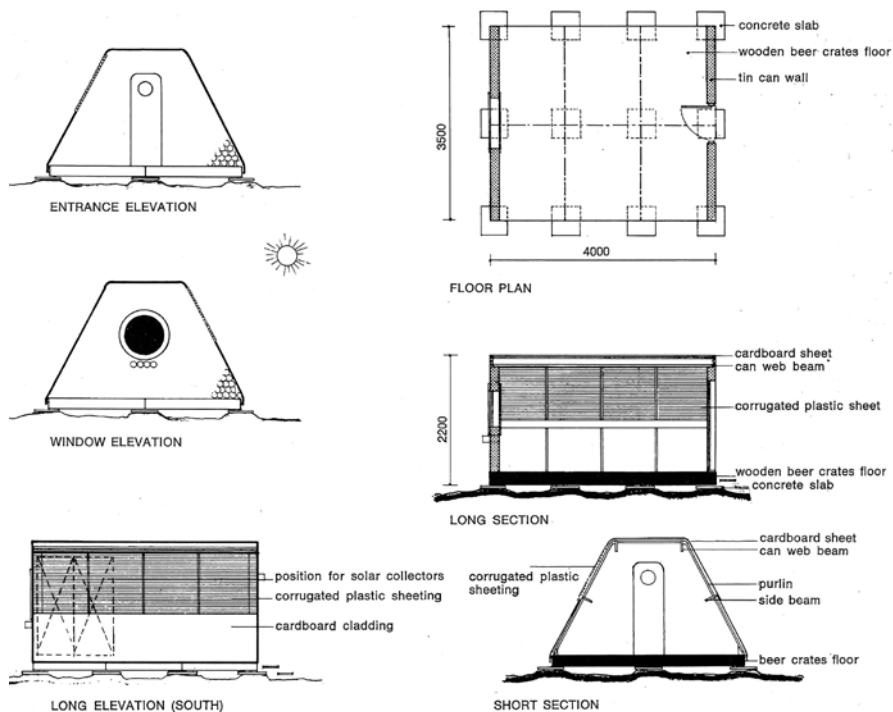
Small house in London, SUG, elevations, plan, section. (Source: Kan and Poteliakhoff 1975)
